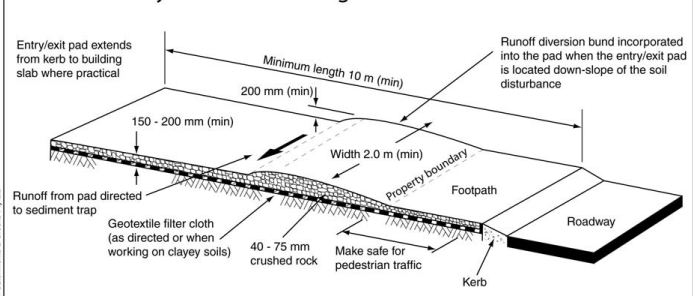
Typical stabilised all-weather site access – PLAN VIEW
